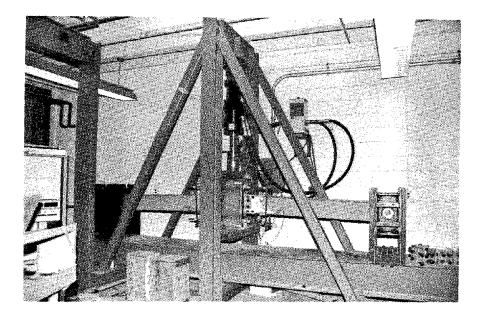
LOADING FRAME AND TEST SET-UP
